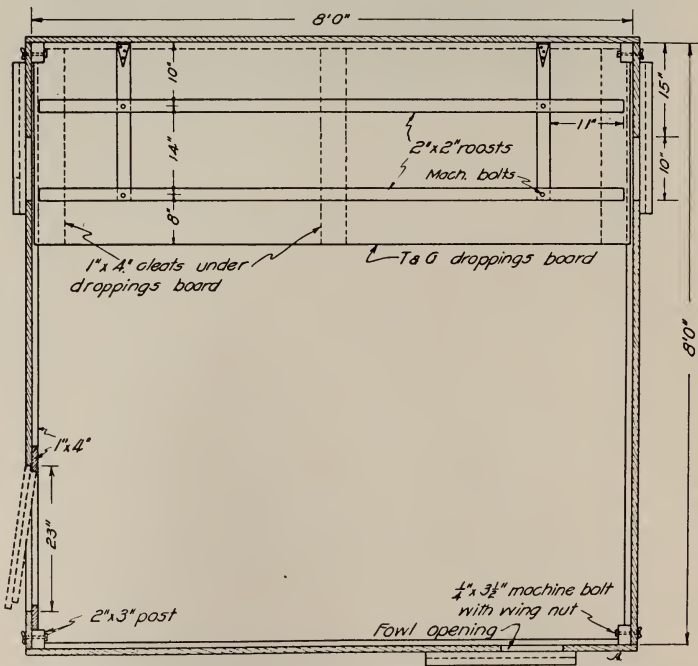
Floor plan of 8 × 8 foot knock-down poultry house showing how ends are bolted together.
